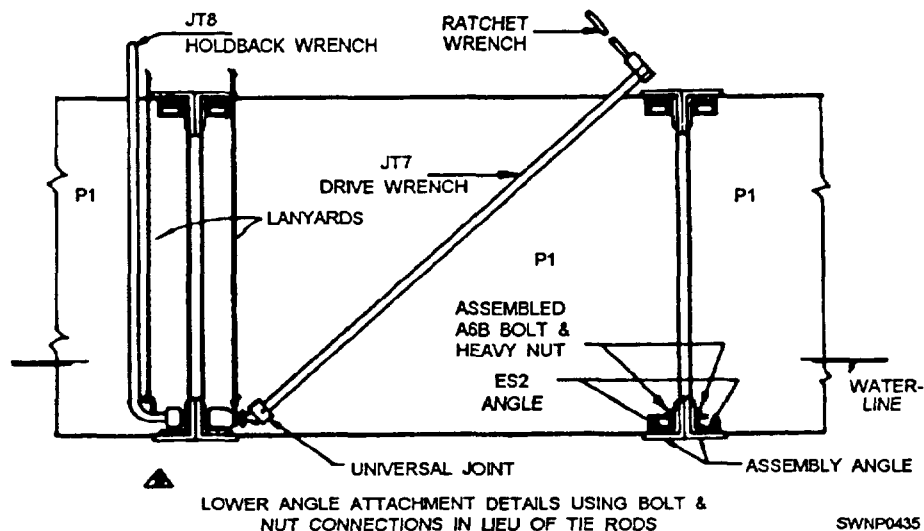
Lower angle attachment details using bolt and nut connections instead of tie rods.
